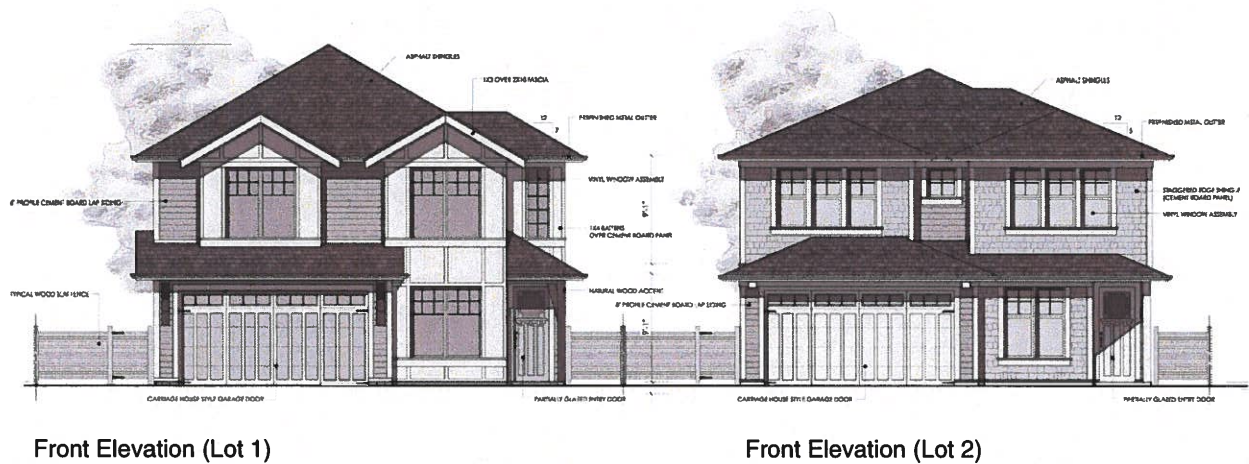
Proposed Building Elevations (Lot 1 and Lot 2) (from plans by Outline Home Design)
